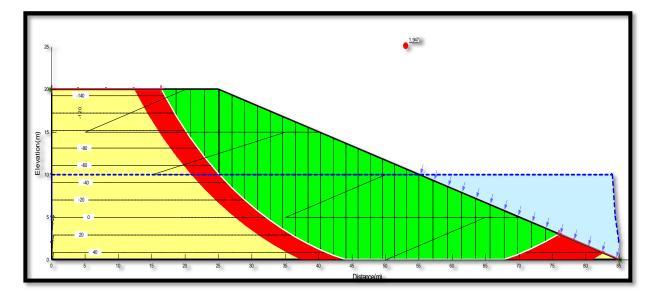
Embankment cross section for 1:3 slope at 5 m water level
